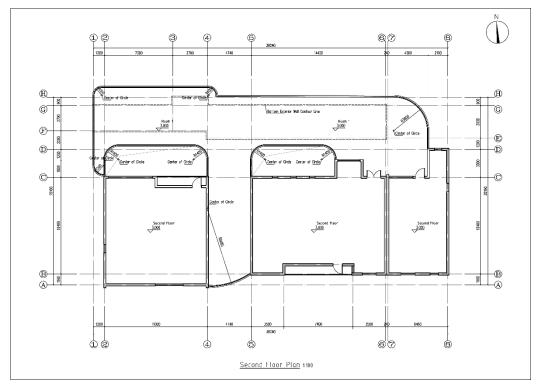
The Second Floor Plan of Building Complex (Drawn by the author)
